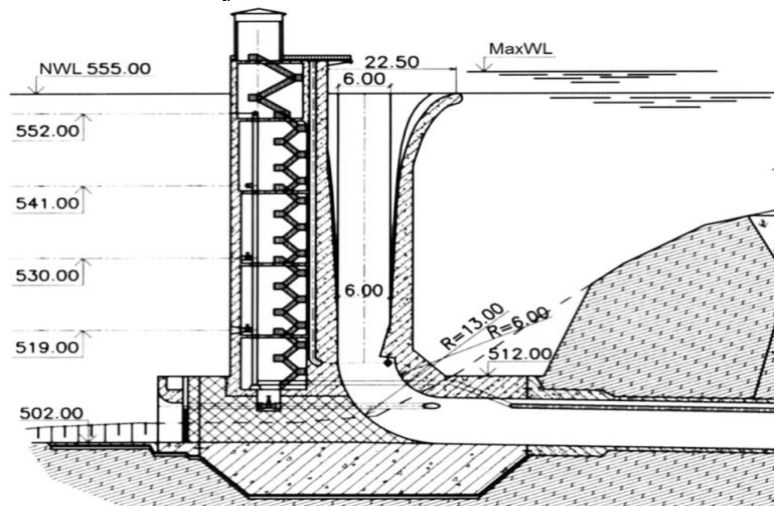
Longitudinal section of the shaft spillway of the Djedra dam.
